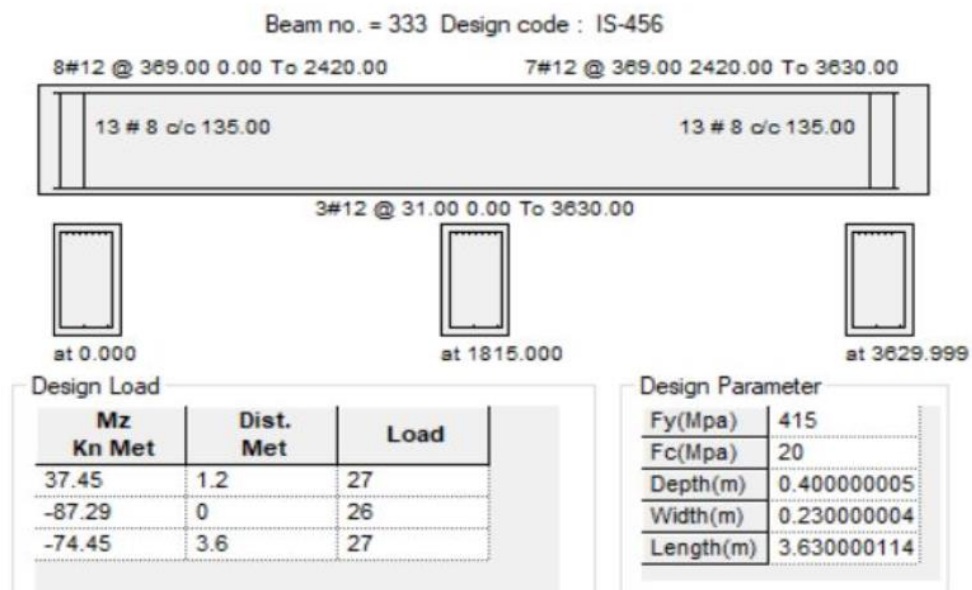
Longitudinal Reinforcement schedule for beam 333 (Seismic)
